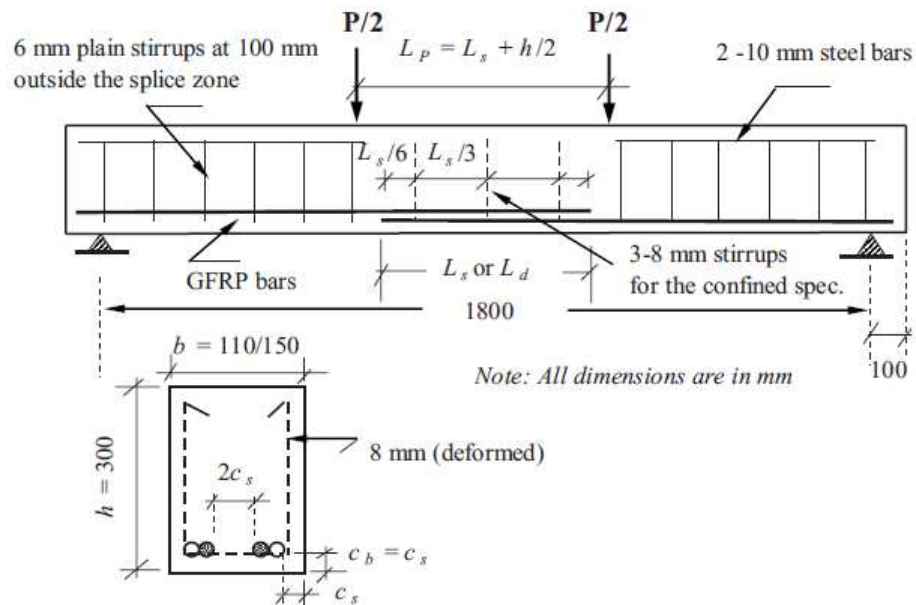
Test setup, geometric dimensions, and reinforcement details of specimens tested by (Harajli and Abouniaj 2010)
